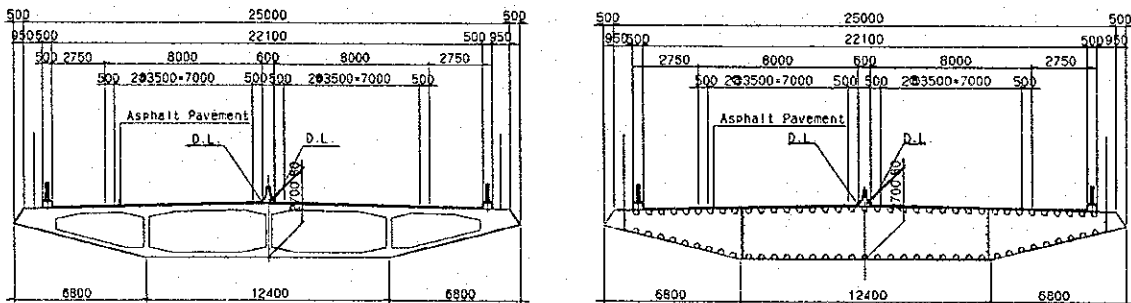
Main Bridge (PC Box Girder & Steel Box Girder)
